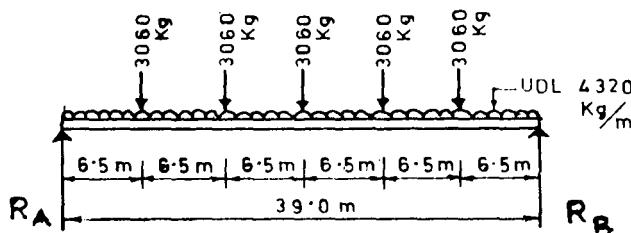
·17 LOAD ON GIRDER (Weight of deck slab and cross beam) (Example 16·1)
